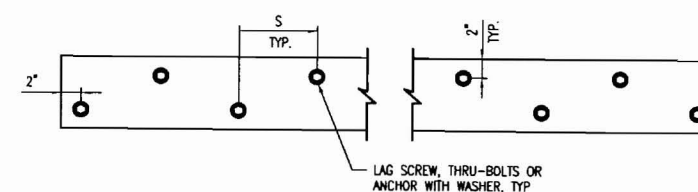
LEDGER BOARD FASTENER SPACING AND CLEARANCES
